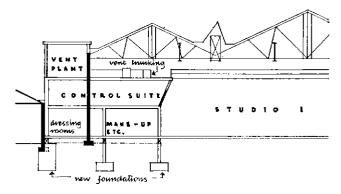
Diagrammatic section through new control suite to Studio R1 showing deep foundations
